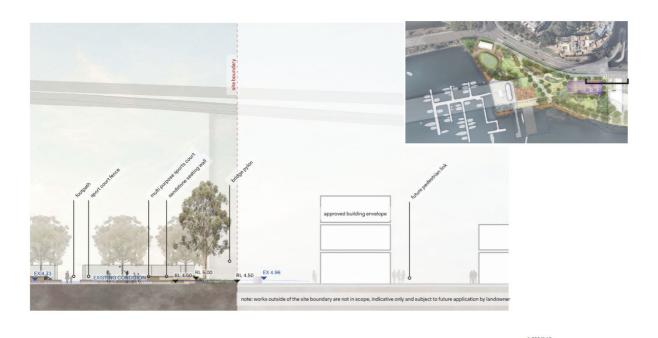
Section H (east-west section) through eastern end of Bank Street Park. (Source: Client provided)
